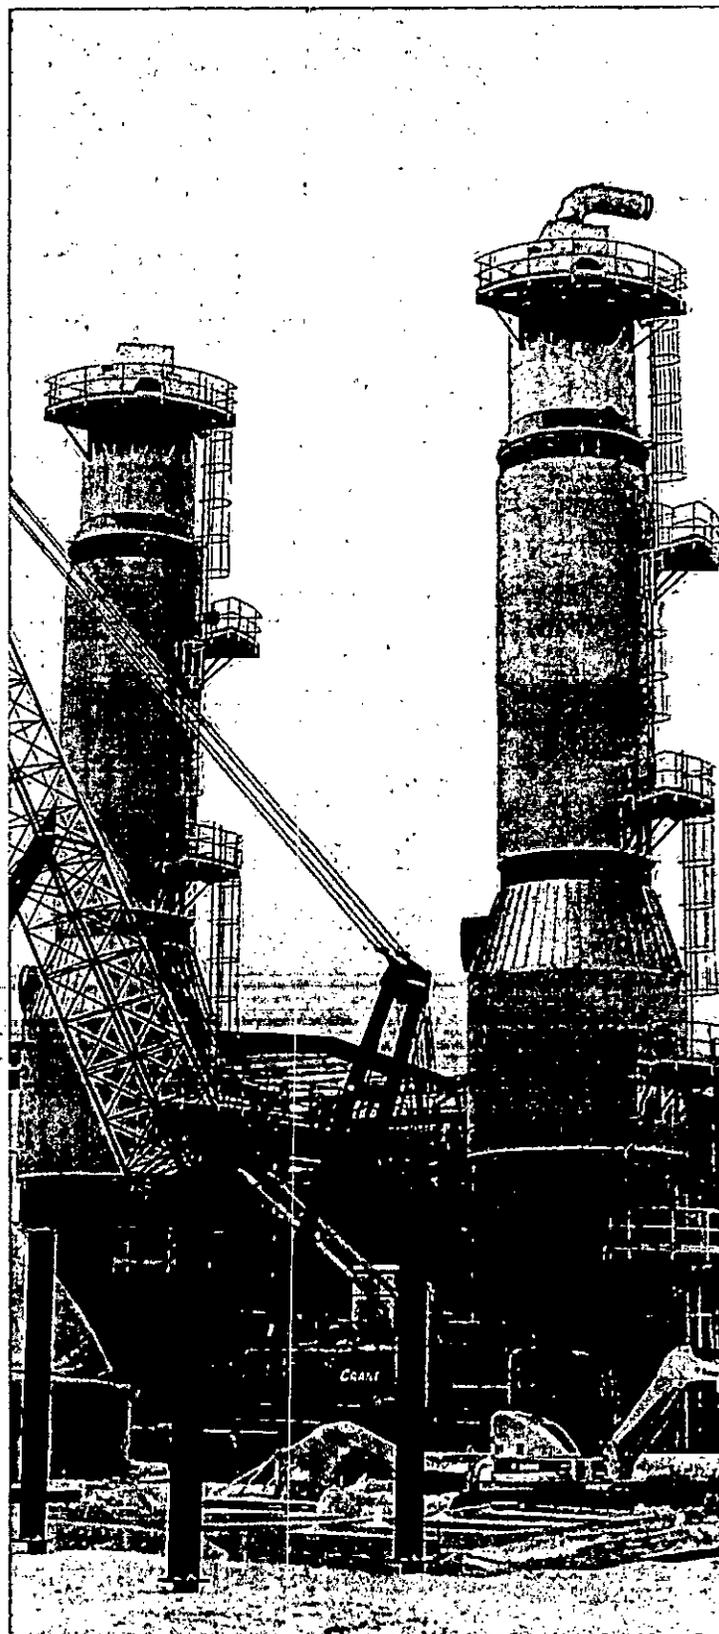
PHOTO: EVAPORATORS AT GREAT DIVIDE POD ONE WITH ONGOING CONSTRUCTION
